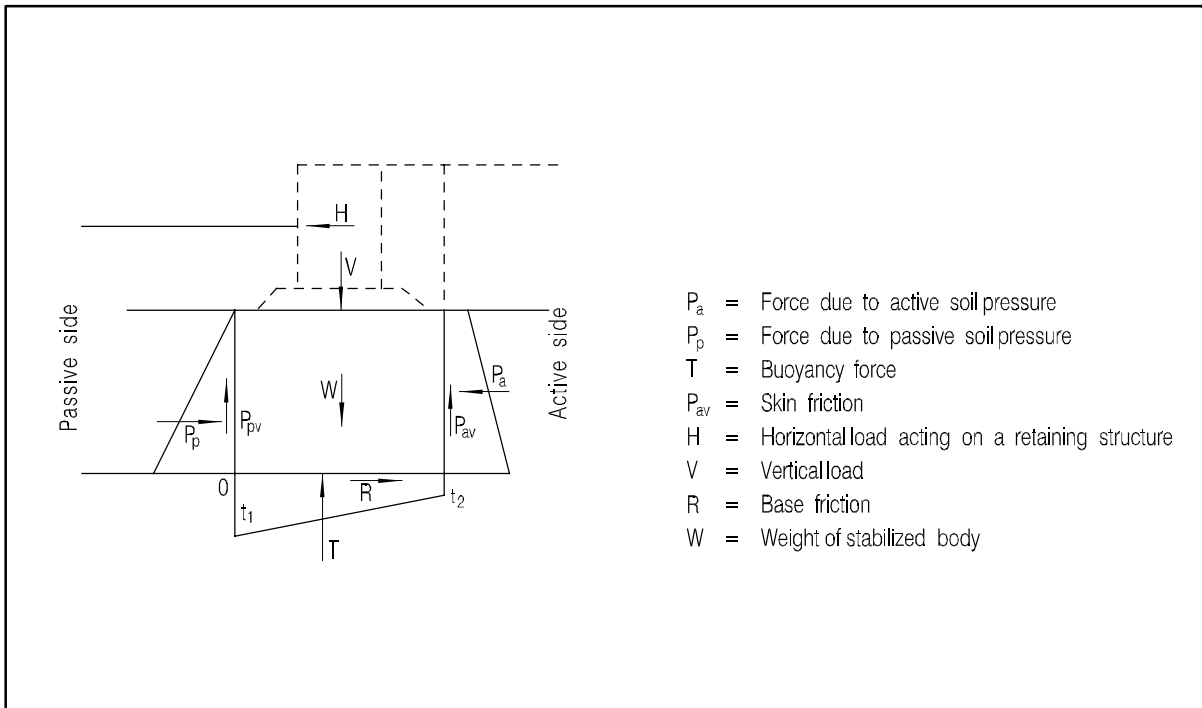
External Forces on Soil Body Stabilized by Deep Cement Mixing
